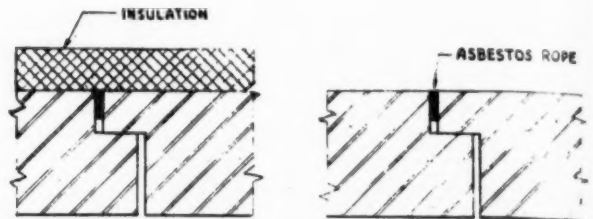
Plan sections of vertical expansion joints in firebrick walls, with and without insulation
